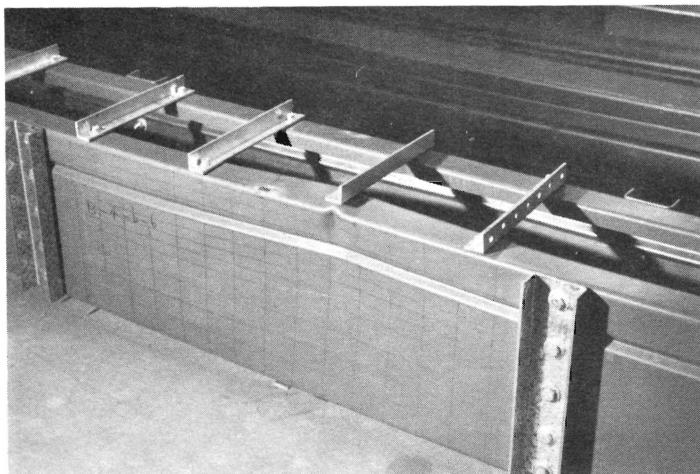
Typical Failure Pattern for Channel Specimens (Photo)
